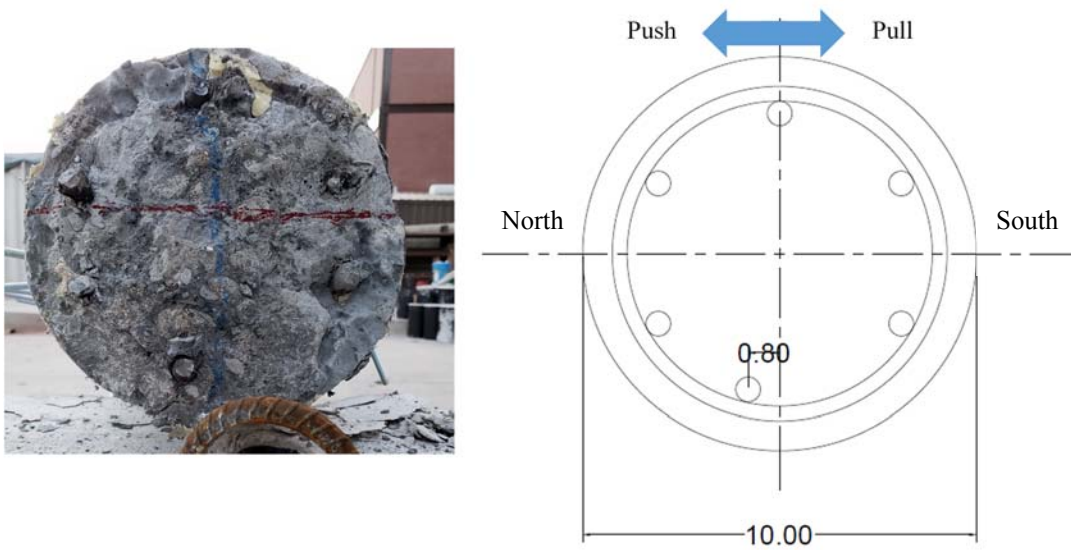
As-built S3 column cross-section observed after column separation from footing.
